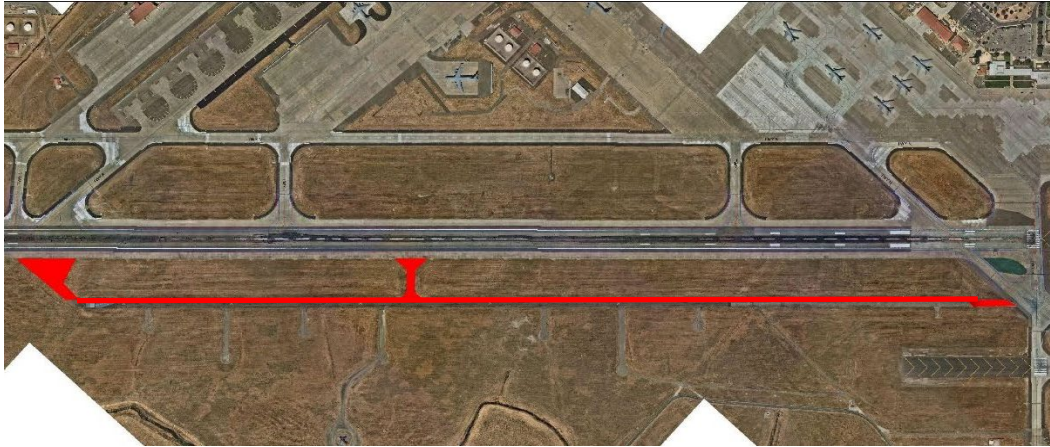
Excess pavement proposed to be removed (highlighted in red) and converted to turf
